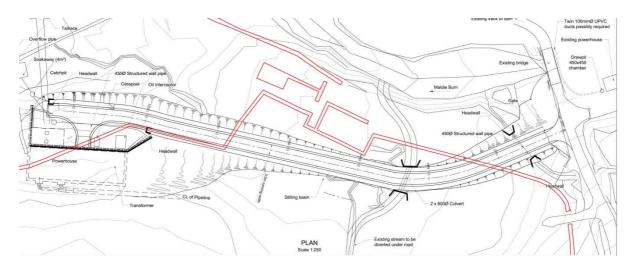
Construction elements, power house, access road, stream diversion, overlaid on plan which shows the more visible wall foundations of the sheep fank and park dyke, in red, as surveyed by Halcrow Group Ltd (Image aligned west to top, north to right)
